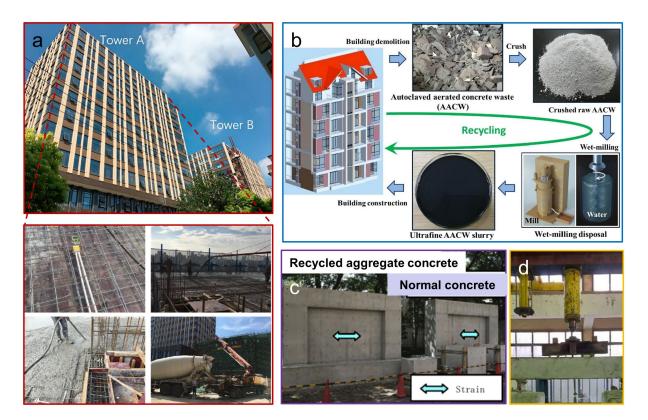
(a) Profile of the project-demonstration buildings and construction of the RAC structure [131]; (b) AACW disposal procedure for recycling utilization [171]; (c) mock-up RAC specimens [79]; and (d) test setup and instrumentation layout of RAC concrete [79].
